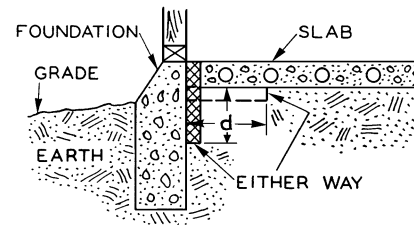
Downward and Edgewise Heat Loss Coefficient for Concrete Floor Slabs on Grade
